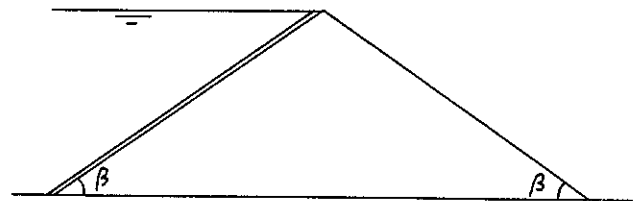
Triangular dam with impermeable membrane at upstream face.
